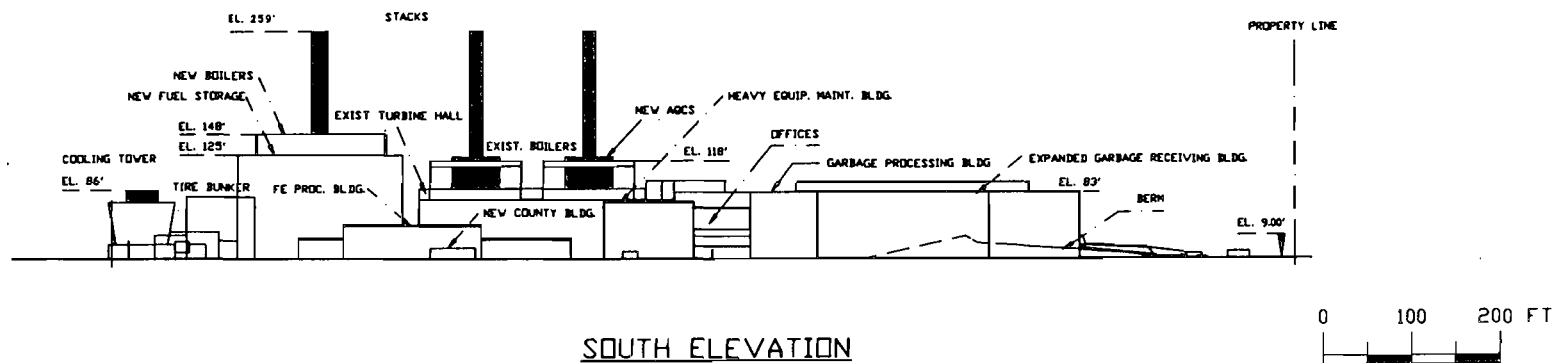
LAYOUT OF PROPOSED EXPANDED DCRRF
